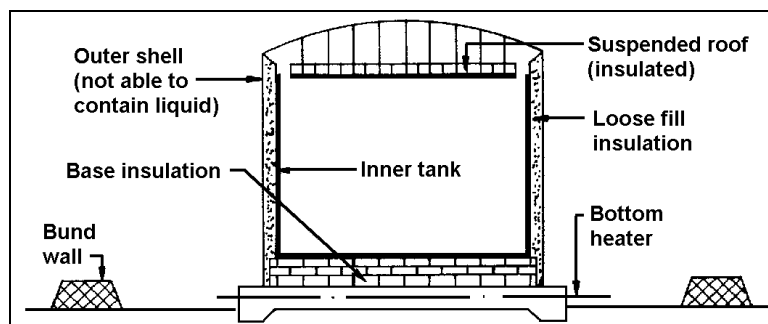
Typical example of a single containment refrigerated tank [EEMUA Pub 147]
